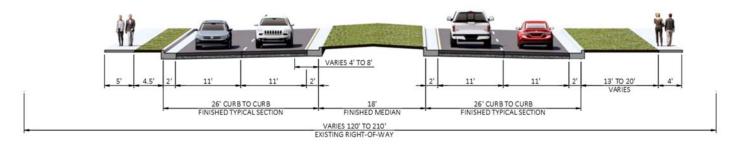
Pavement Replacement Alternative for North Project (WIS 13 to County A), facing north
